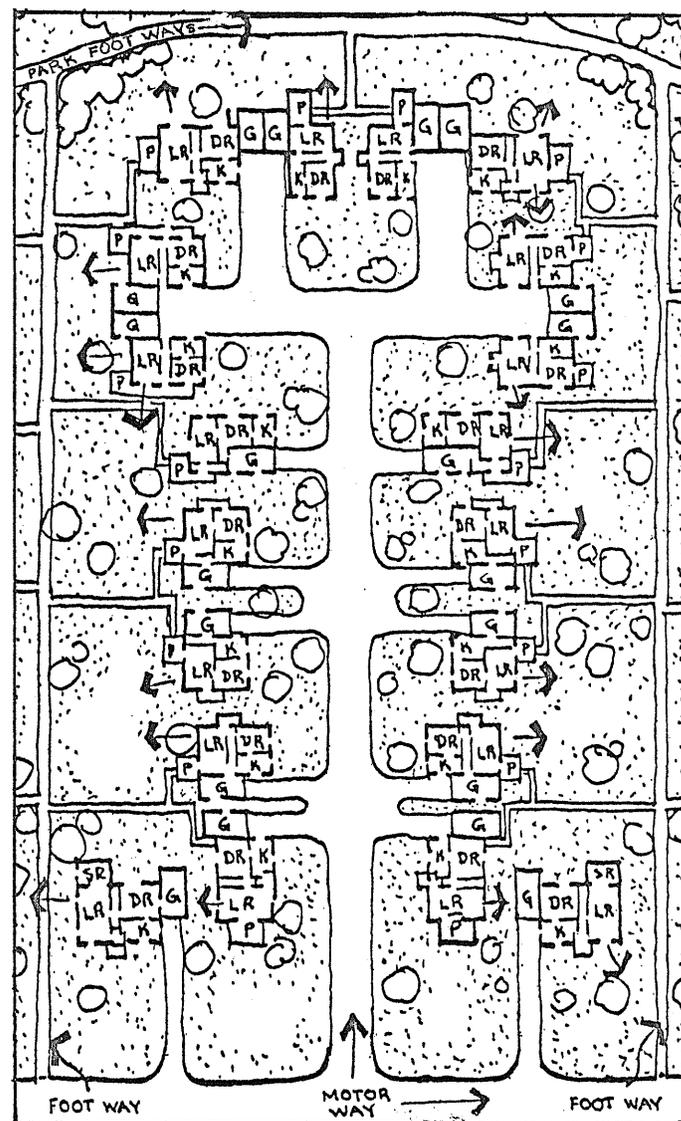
A Typical Street of the Radburn Plan (McMichael, 1949:224)
